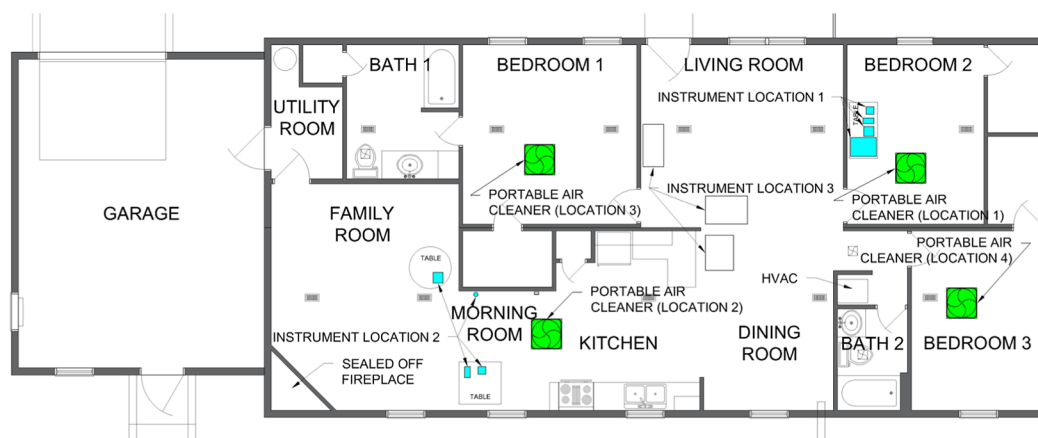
Test house floor plan with two instrument locations (blue) and four portable air cleaner locations (green) noted. Not to scale.
